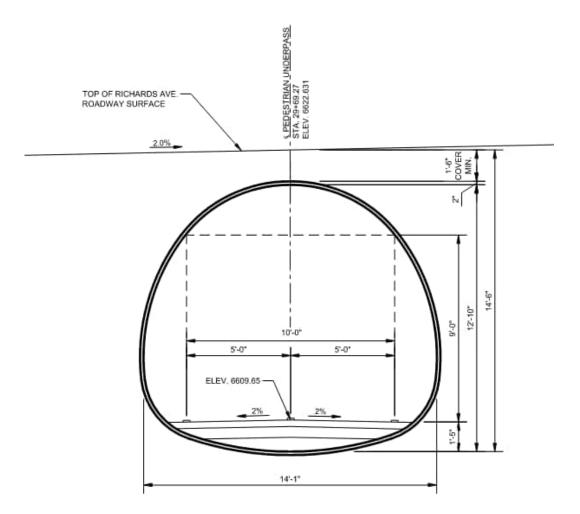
Alternative 1 Typical Section - Structural Steel Plate Pedestrian Underpass Structure
